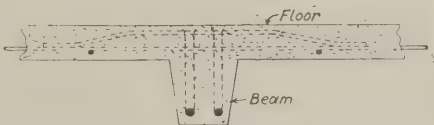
SECTION THROUGH BEAM AND FLOOR PANELS OF FIG. 19.
